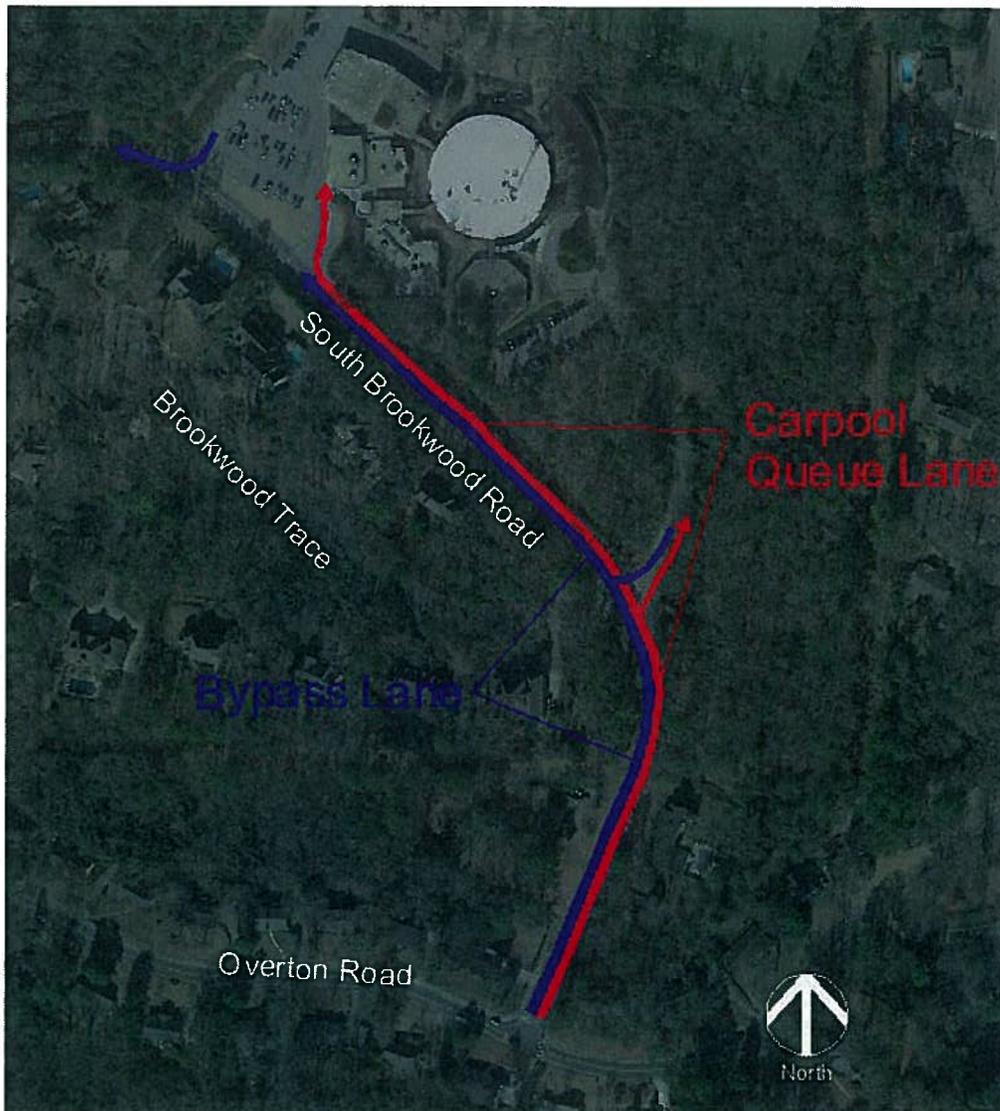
Alternative C – South Brookwood Road One Way Northbound
